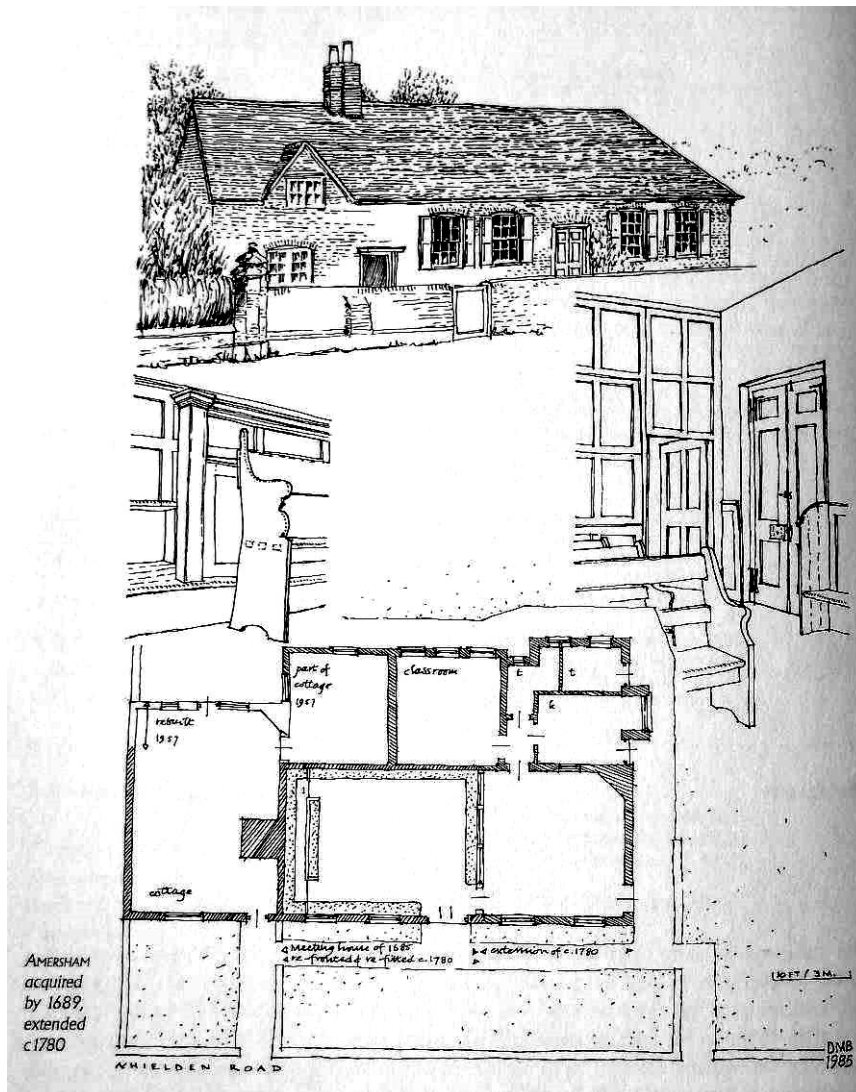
Elevations and plan, from Butler, 1990, p. 22
